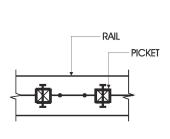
Exterior Connection: Infill Picket Nailed to Endcap - Endcap Screwed to Rail
